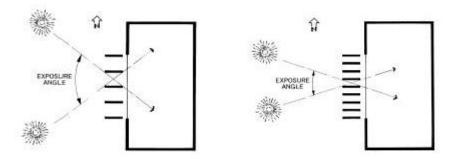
A plan view of vertical fins on a west (east) facade (Ching, 2011)
